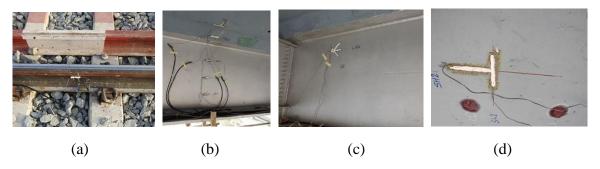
Typical arrangement of strain gages on (a) rail, (b) along the depth of the girder, (c) near to support and (e) at deck slab
